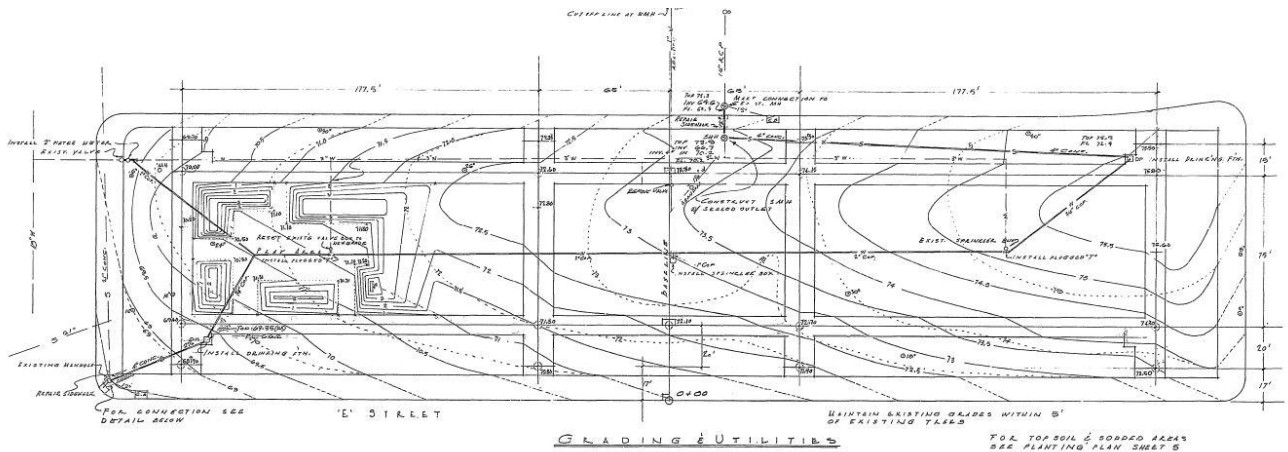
The 1964 grading plan retained the gradual northeast to southwest slope of Marion Park, but added four steep berms surrounding the play area on the eastern third of the park. (“Park Improvement Plan”, TIC 823/80029, NCA)
